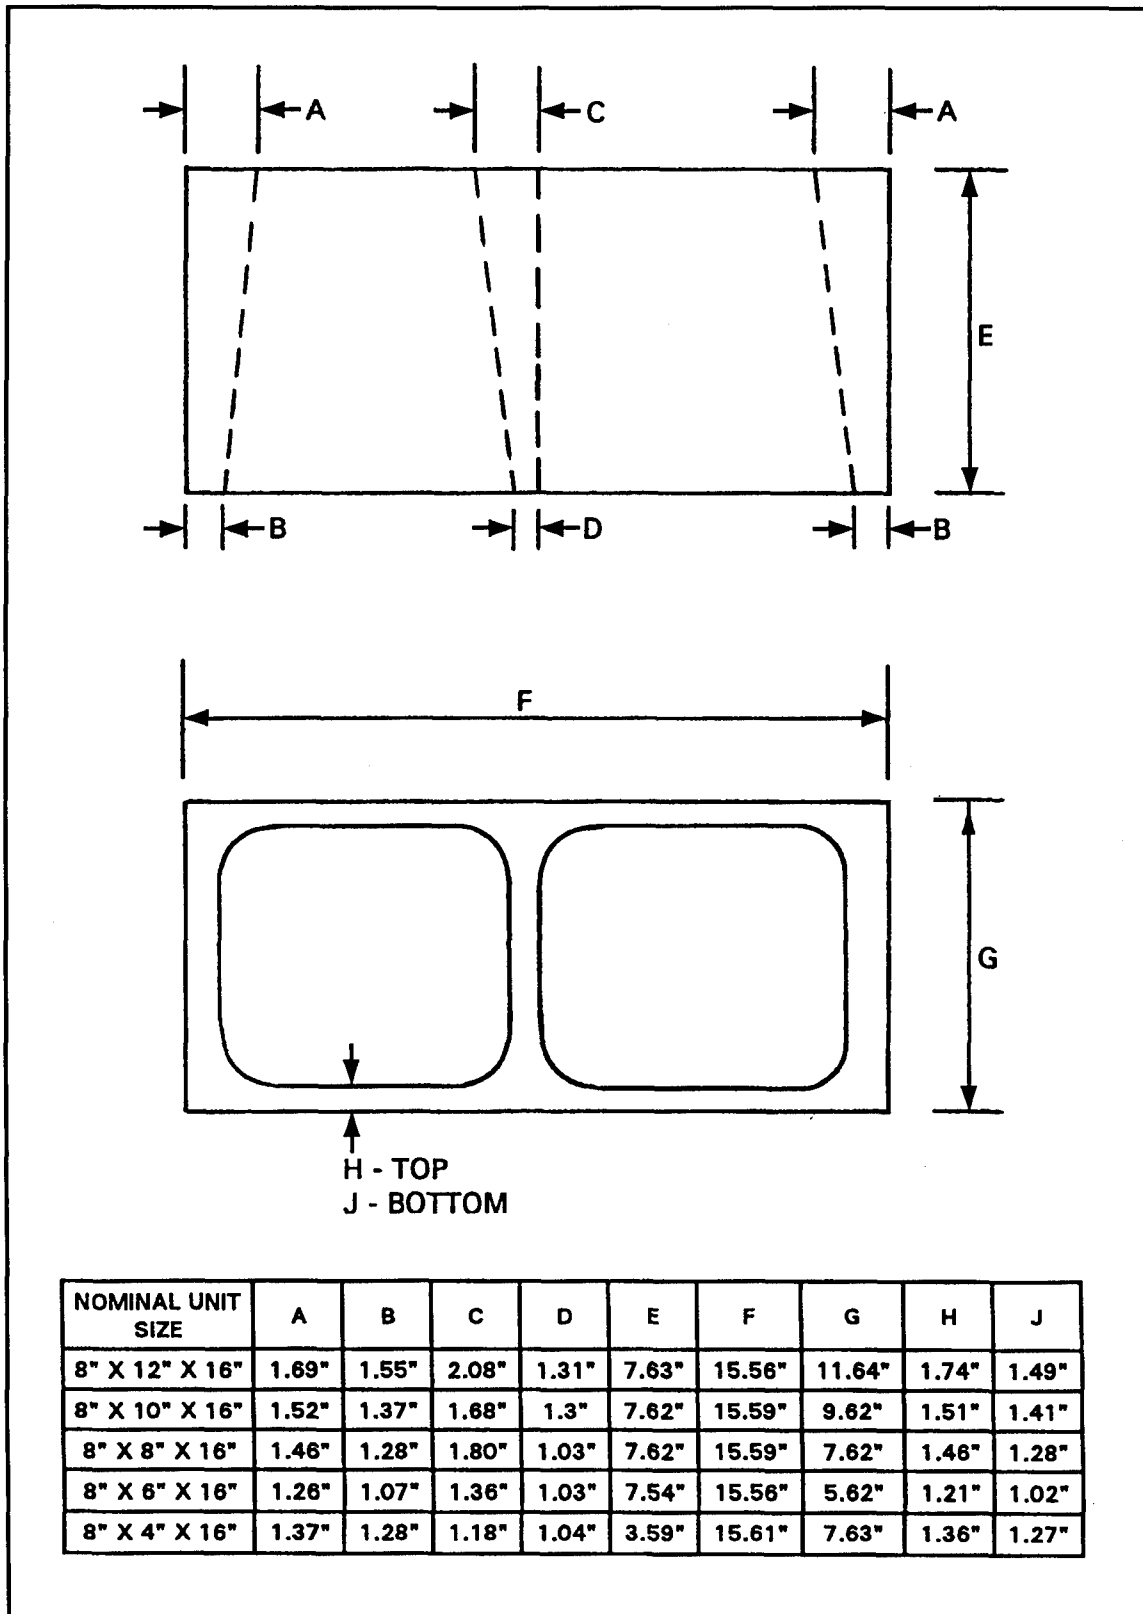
Typical elevation and cross section of the 12-, 10-, 8-, 6-, and 4-in. concrete masonry units
